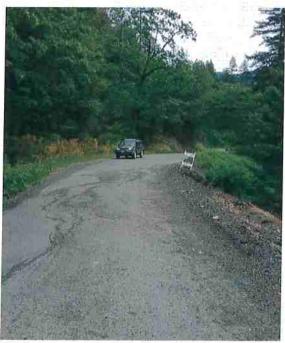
BMR PM 1.93, 20-ft. wide asphalt surface with a longitudinal slope of 9%, narrows to 16 ft. wide at a slope failure, east of the pinch point there is a 6 ft. wide by 30 ft. long pullout along the cutbank, and west, a 7-ft. wide by 35-ft. long pullout to allow passing.
